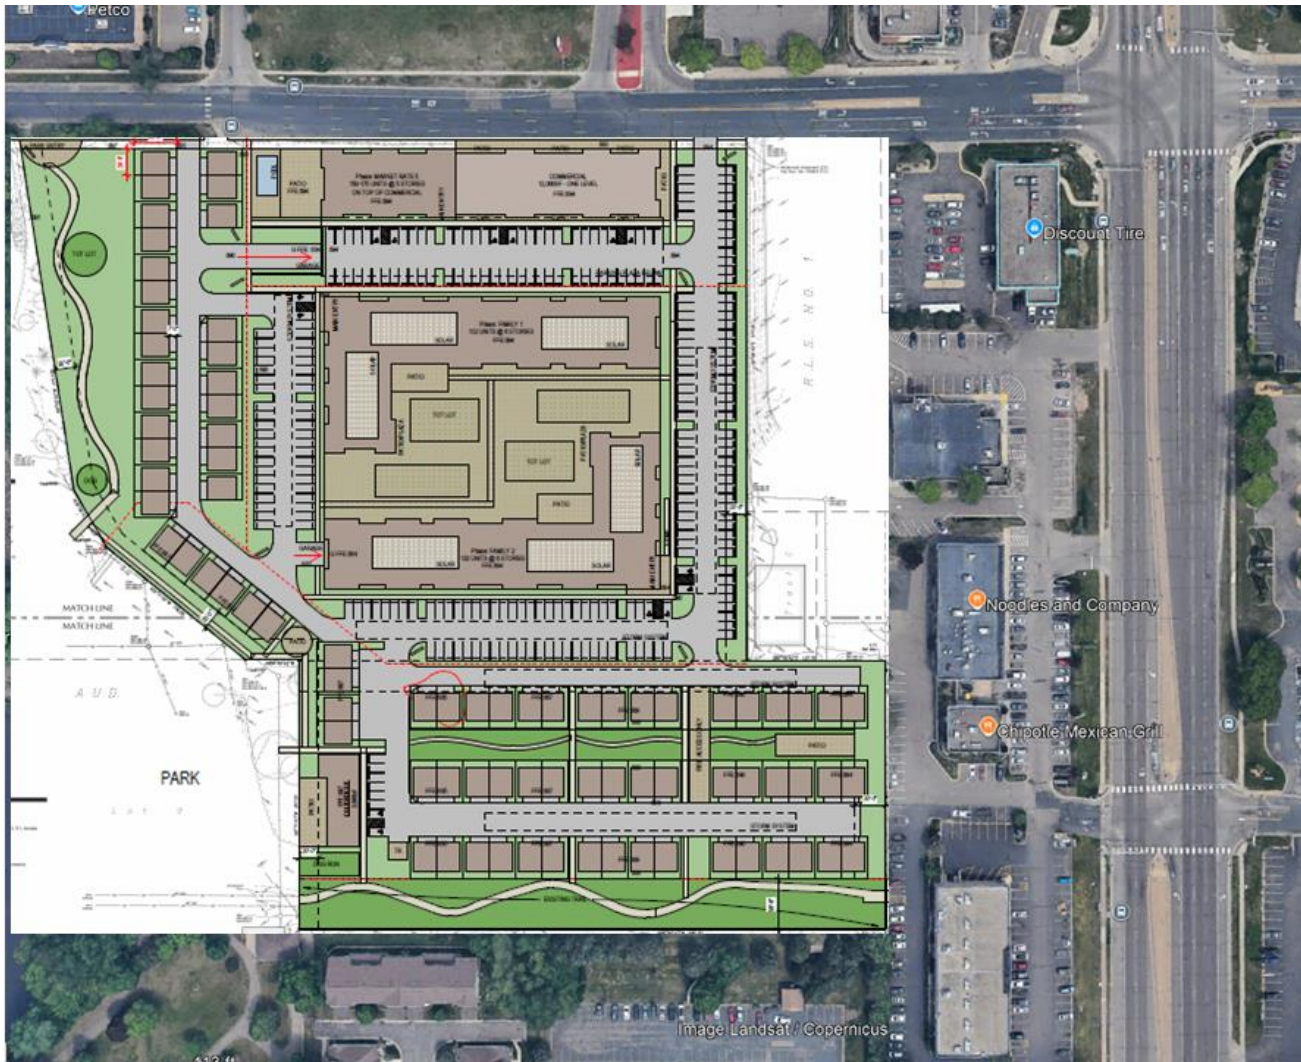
Project Layout Relative to Central Avenue and 53 St N
